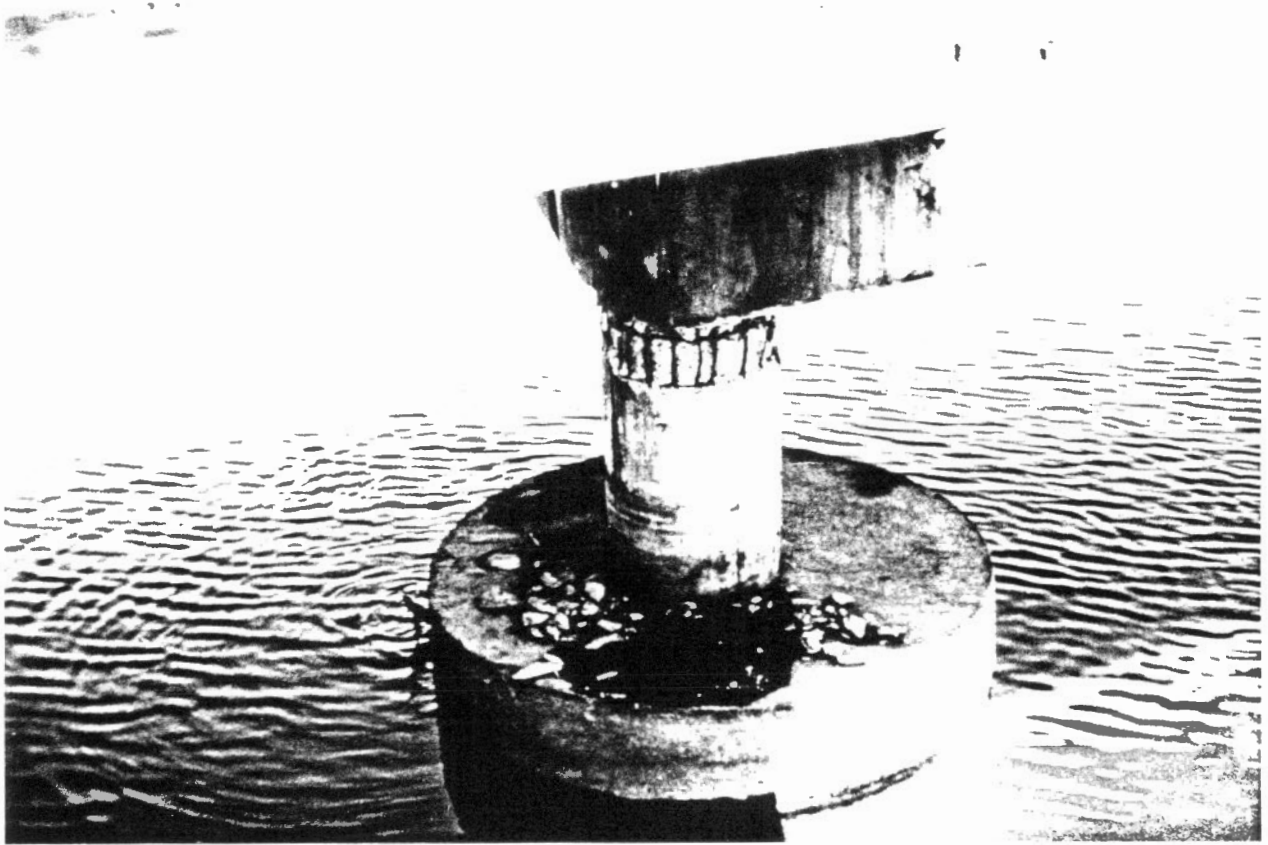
Spalling at top of reinforced concrete bridge pier, port of Lazaro Cardenas access road. All 5 piers on each of the two parallel bridges showed the same damage. Some hammering damage was noticeable at the expansion joints in the bridge superstructure. There was also minor settlement of the bridge approaches, which were fill embankments.
